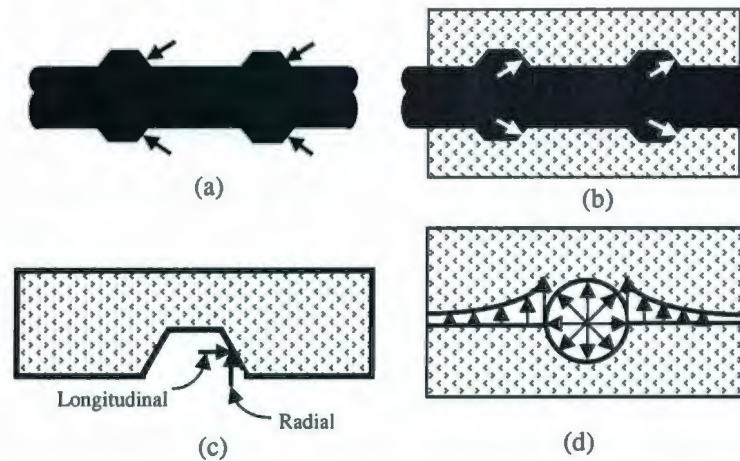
Mechanism of Bond Transfer (a) Forces on Bar (b) Forces on Concrete (c) Components of Forces on Concrete (d) Radial Forces on Concrete and Splitting Stress (MacGregor, 1992 [30])
